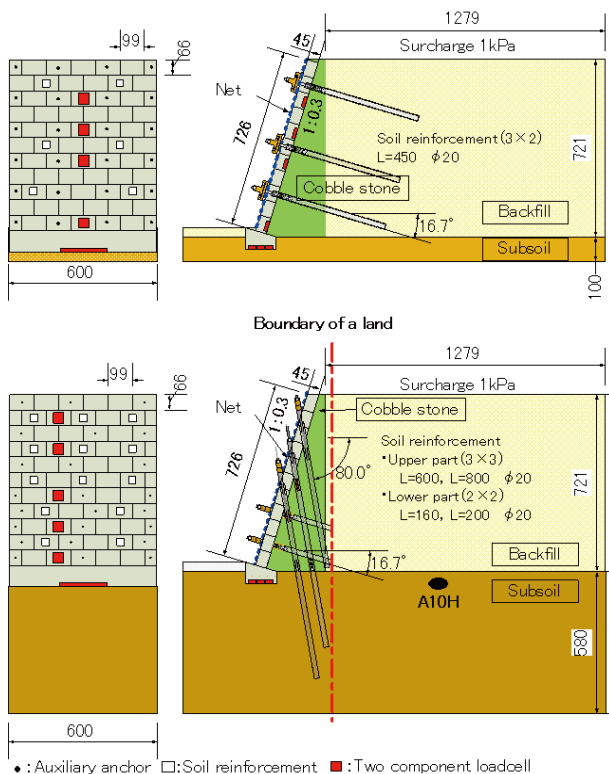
Outlines of the shaking table model tests of the two reinforced masonry retaining walls (units in mm), after Nakajima et al., (2017)
